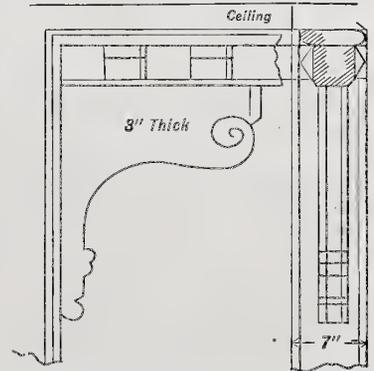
Wood Beam in Second Story.—Scale, $\frac{3}{4}$ Inch to the Foot.
